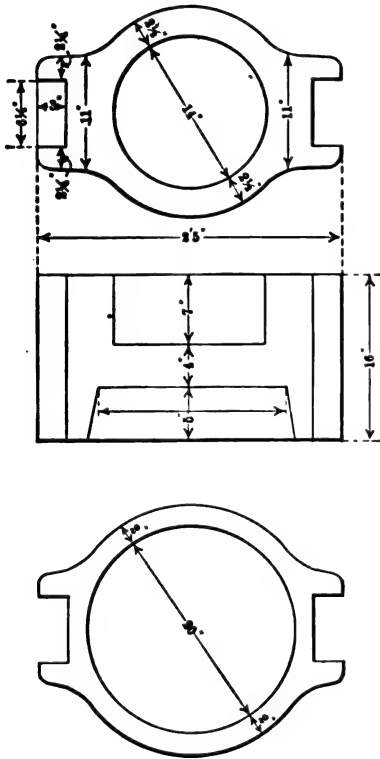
FOLLOWER CAP FOR WOOD PILES.
